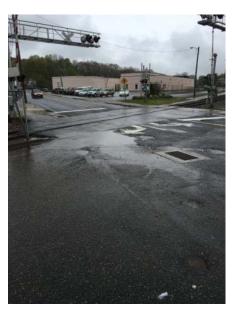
East Coast Greenway Trail Between Building and Rail Tracks
